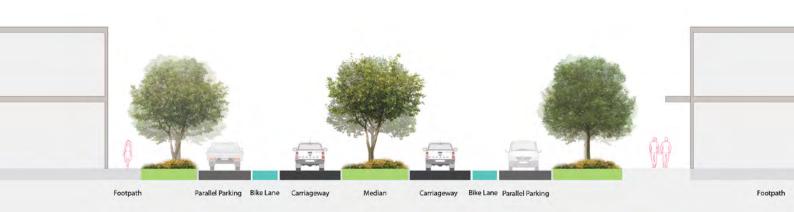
Proposed upgrades in Darlot Street - Typical Section
